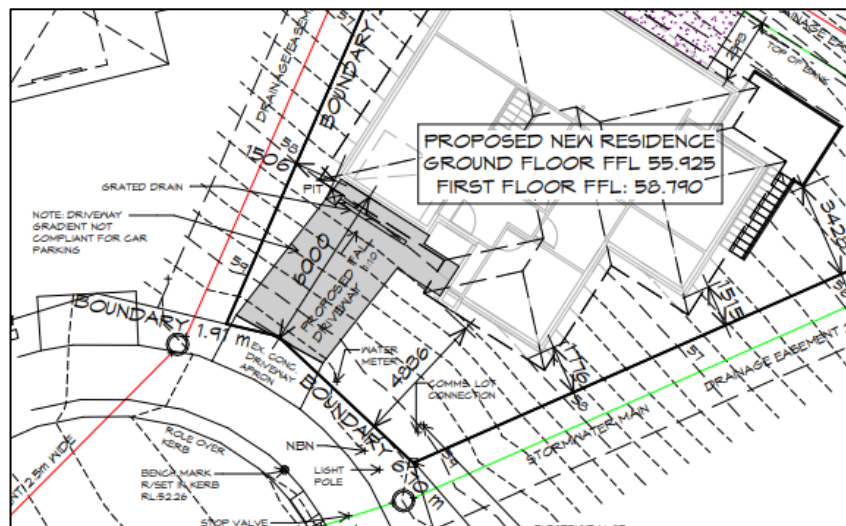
Snapshot of PLN-20-489 Plans received 26/11/2020
